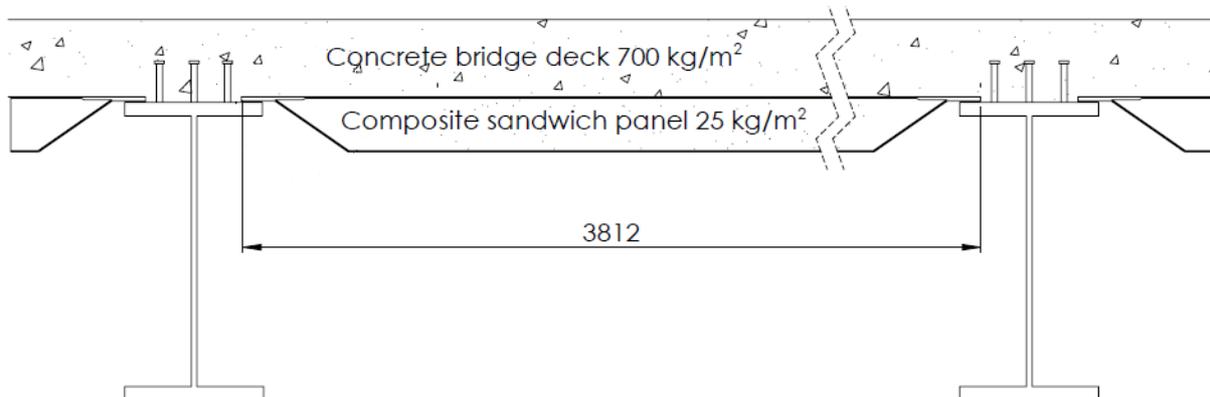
Principle of composite sandwichpanel as formwork for casting concrete.
